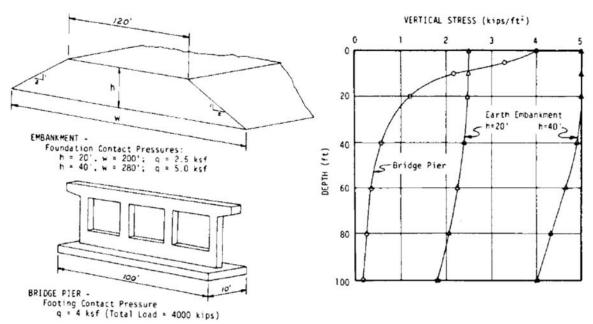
Figure. Computation of vertical stresses beneath center lines of bridge piers and earth embankments (NCHRP, 1971).
